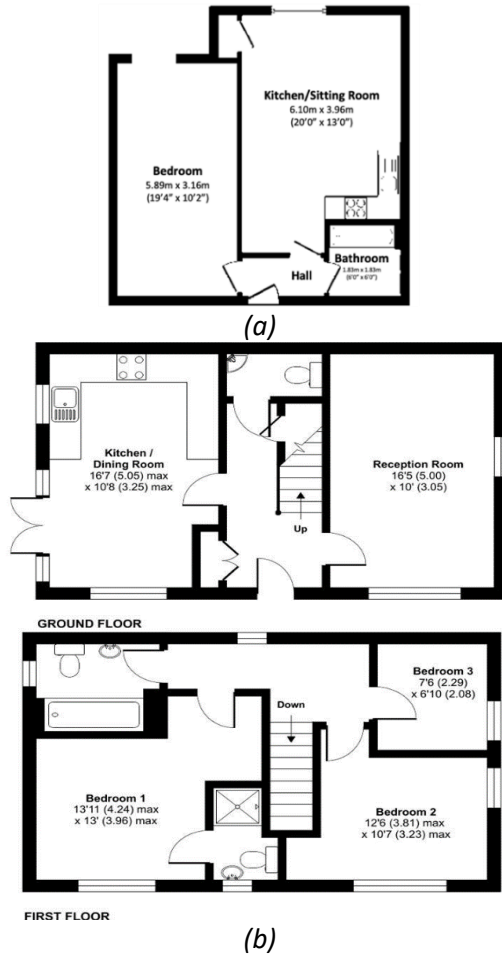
Floor plans for: (a) flat; (b) detached house [8].
